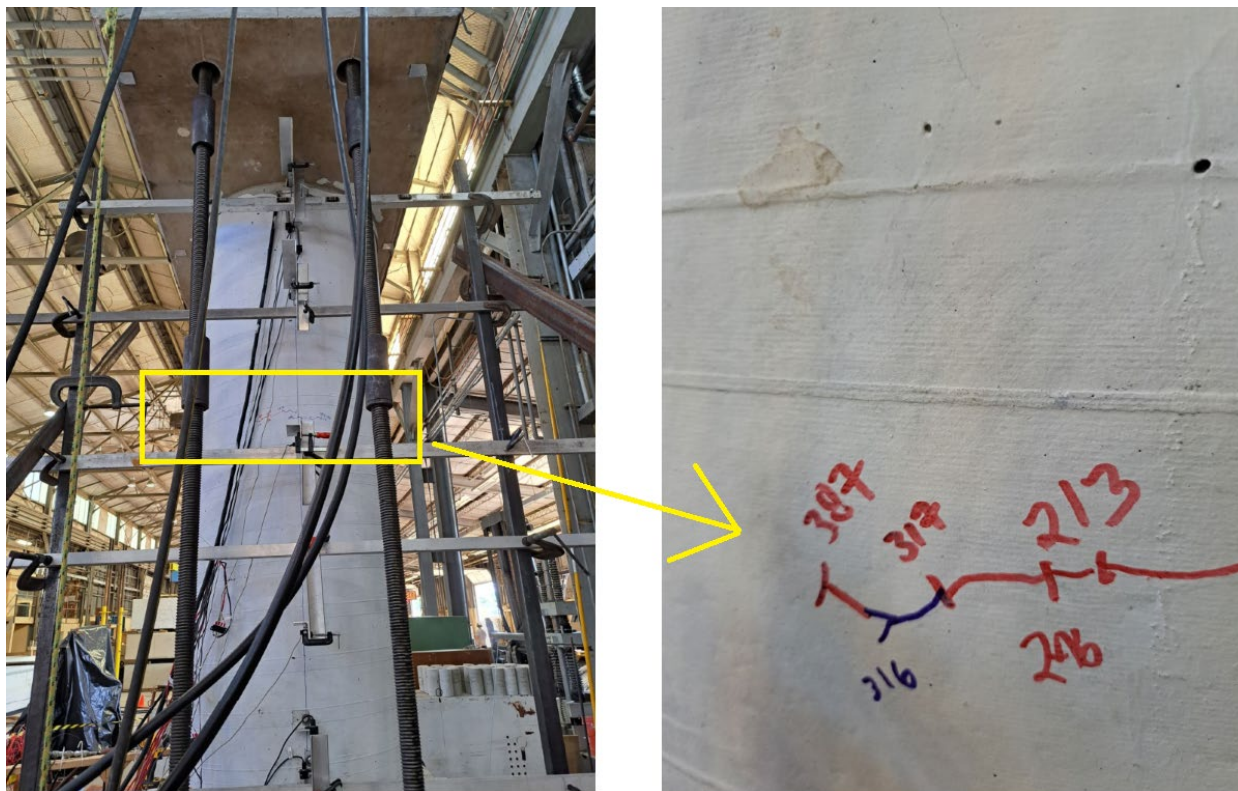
Cracks after 6-in Test for Specimen S1-CIP.
